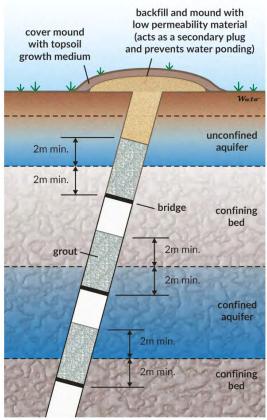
Capping and plugging of drillholes intersecting multiple aguifers.
